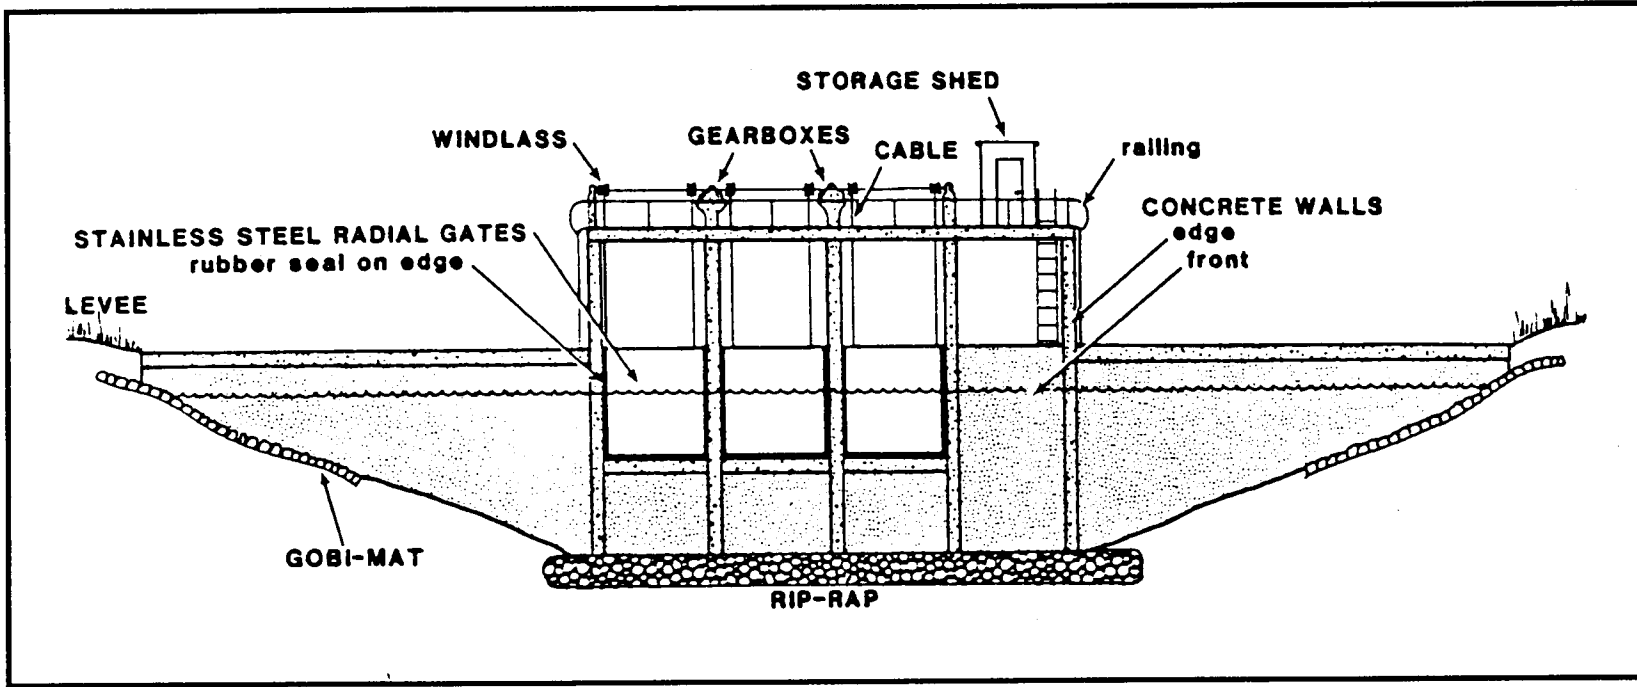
Rockefeller Refuge concrete radial arm lift gate: site plan (Wicker et al. 1983).
